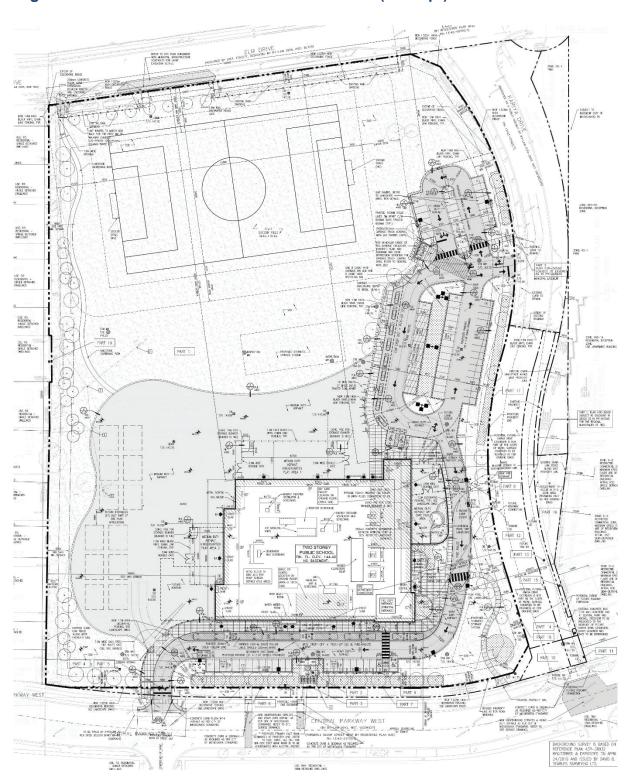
Peel District School Board Site Plan (Excerpt)
